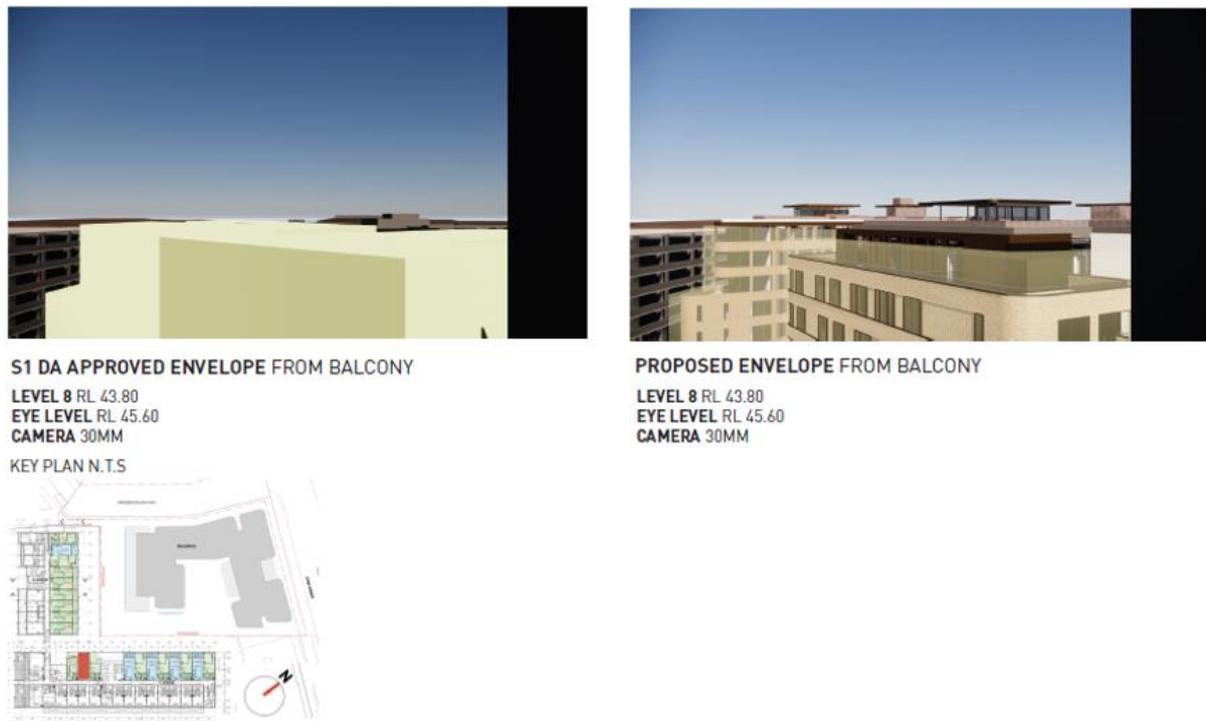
17 Joynton Avenue: modelled impacts of view from balcony of south-western apartment on level 8. This apartment has no view of the CBD.
